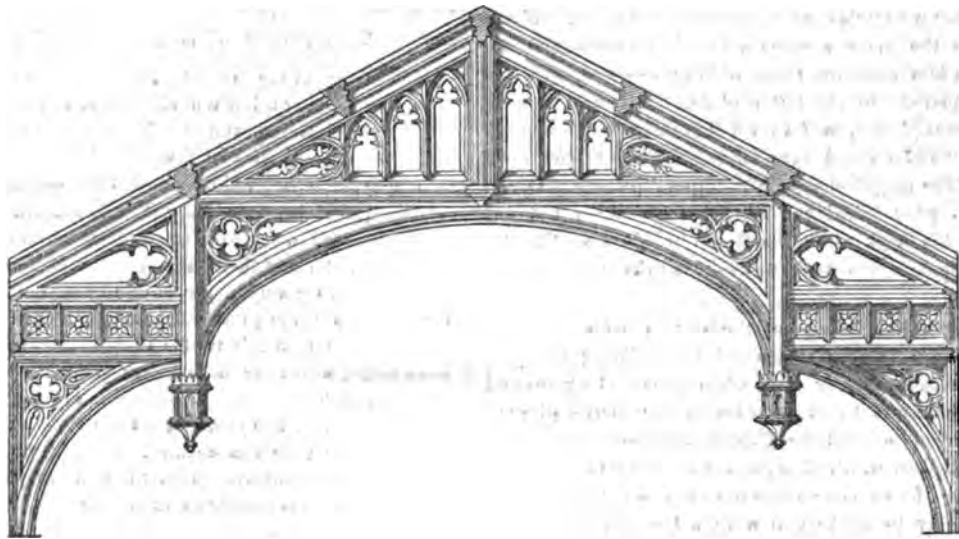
Roof of Ravensworth Castle Dining-Room.
